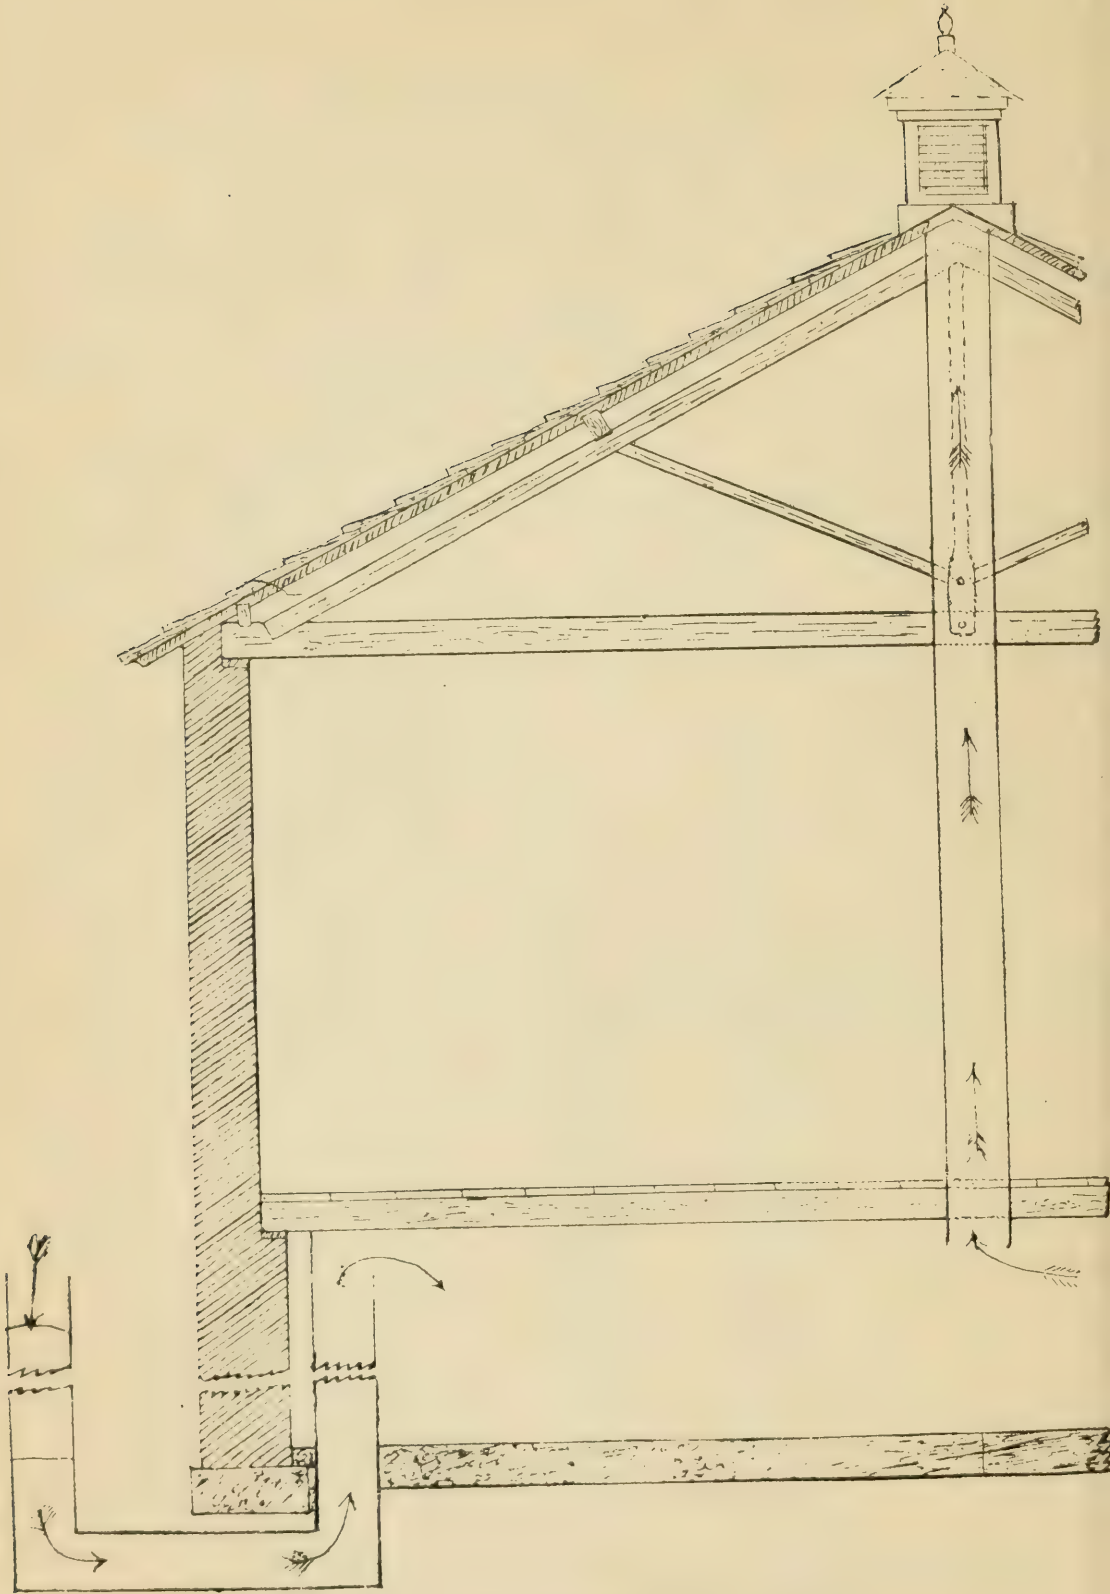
Dr. Rutherford's plan of ventilation—U pipes.
